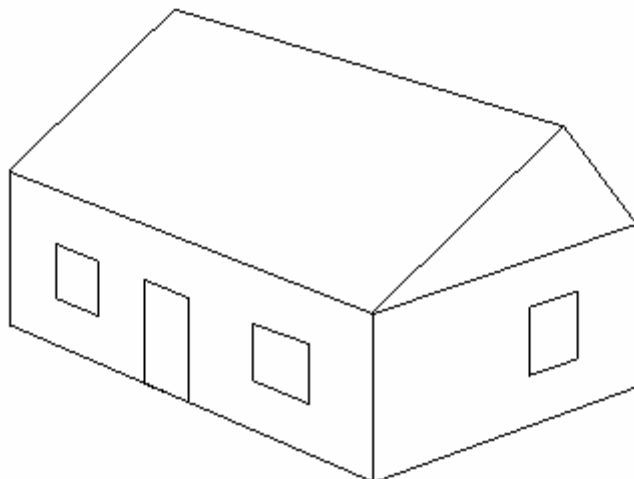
One Story House with a Thermally Isolated Attic
